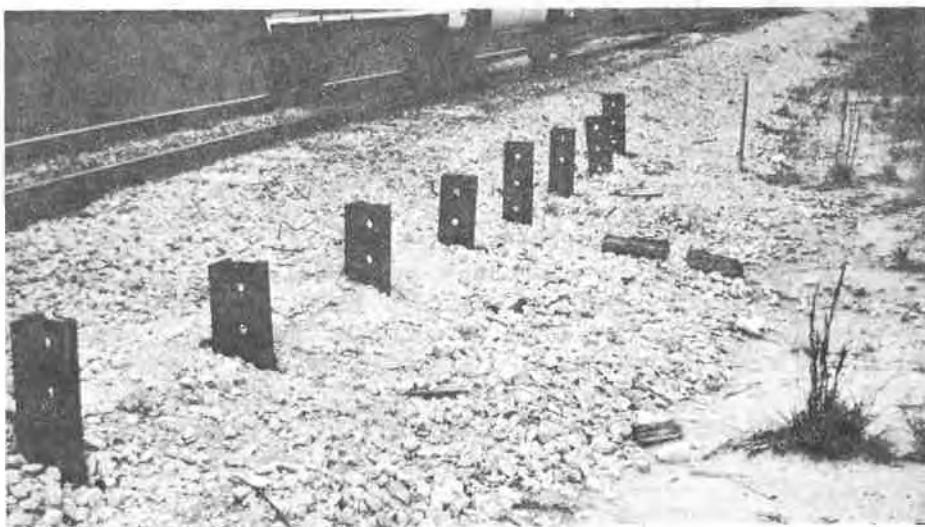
Rail sections driven into ground in effort to stabilize railway embankment.
